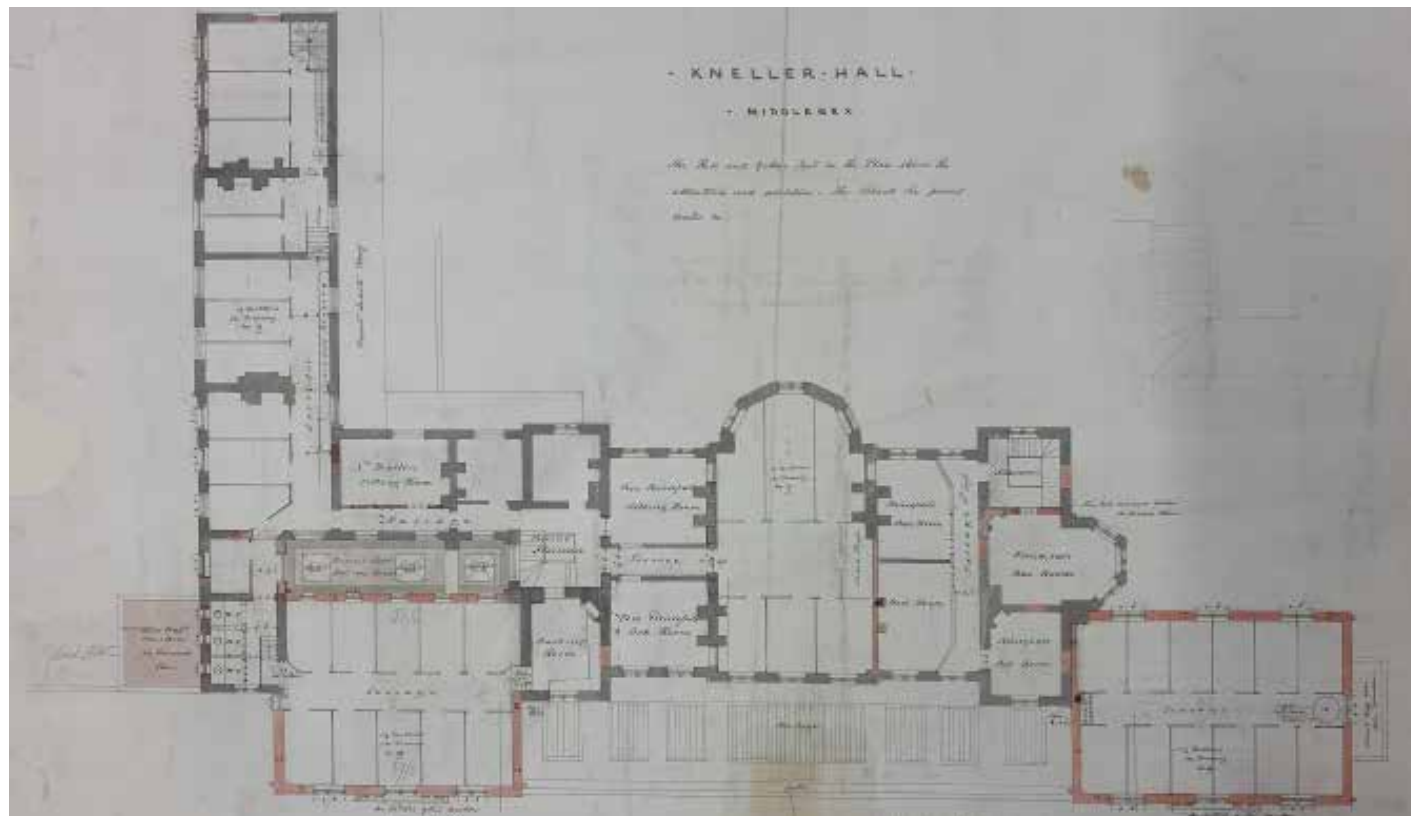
1848 proposed first floor plan of Kneller Hall, unrealised (black showing the existing building and red showing the proposal). By George Mair.
